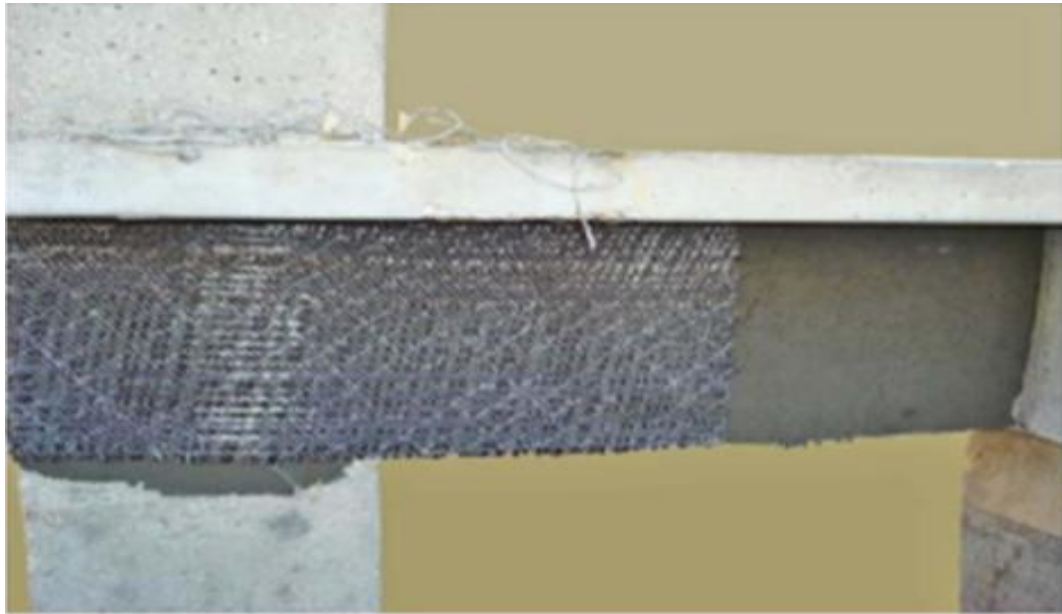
Beam-column joint strengthening with TRCC (Al-Salloum et al., 2011)
